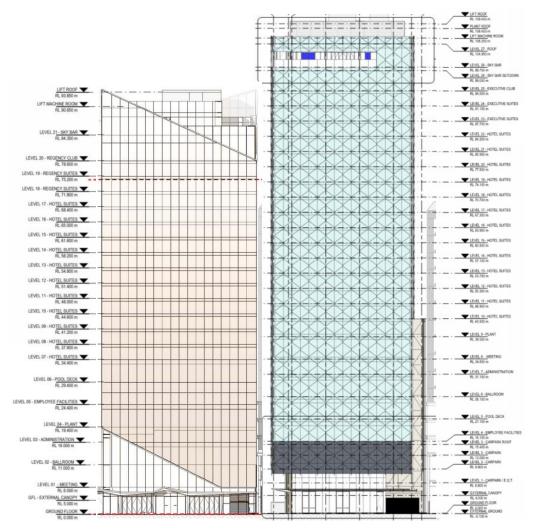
North elevation: new proposed design (L), CFD simulated previous design (R)
